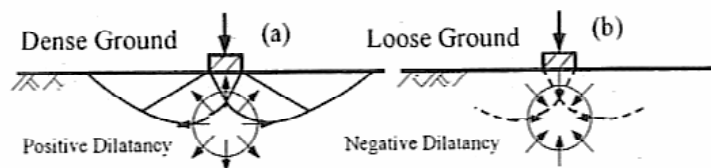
Illustration of shear failure pattern due to the subsidence of surface footing, (a) general shear failure in dense ground, (b) local shear failure in loose ground
